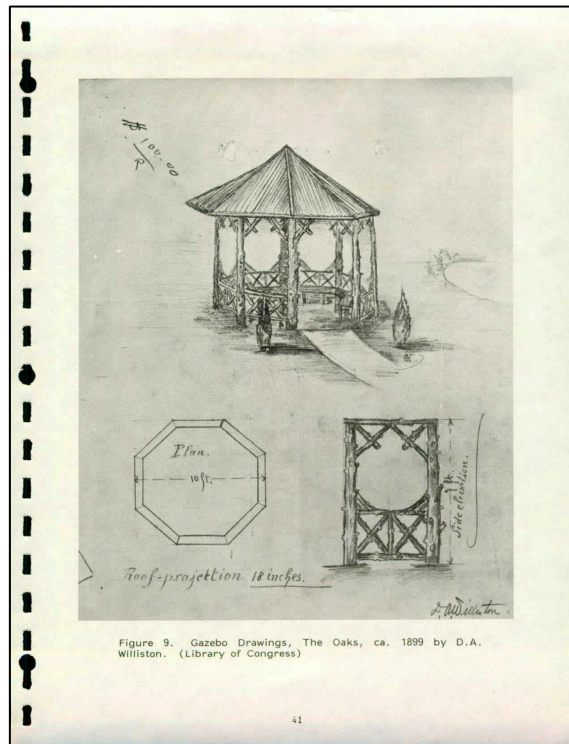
Williston's design of the summerhouse, c. 1905 (Historic Structure Report, 41)
